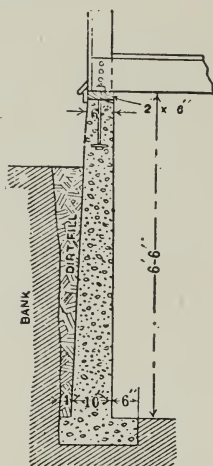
Battered Concrete Cellar Wall. Light Building.
